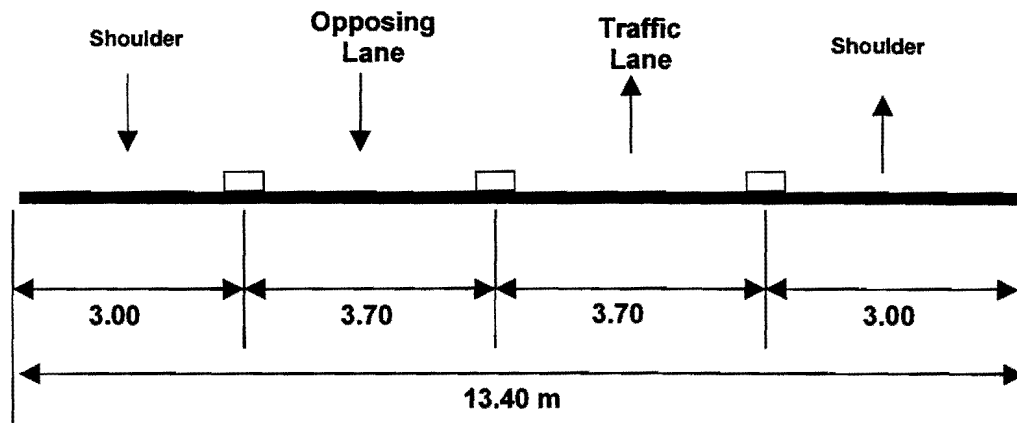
Existing Rural Two-Lane, Two-Way, Cross-sectional Geometric Section.
